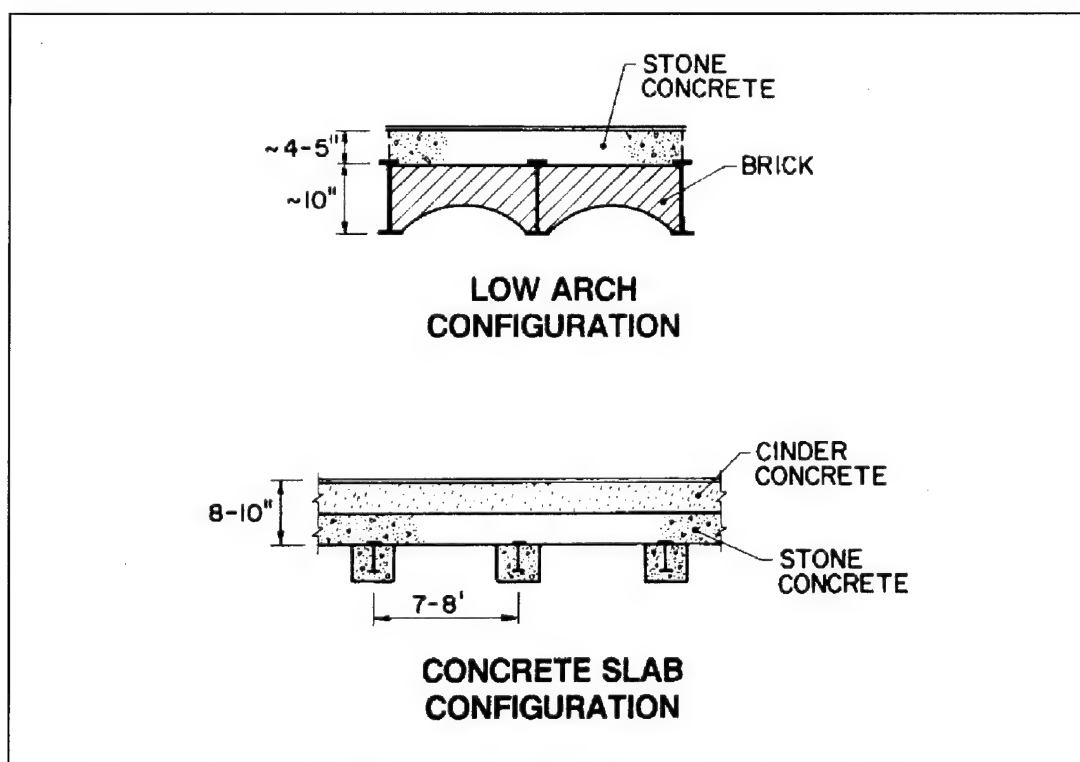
Shallow masonry arch floor construction and flat slab floor construction.
